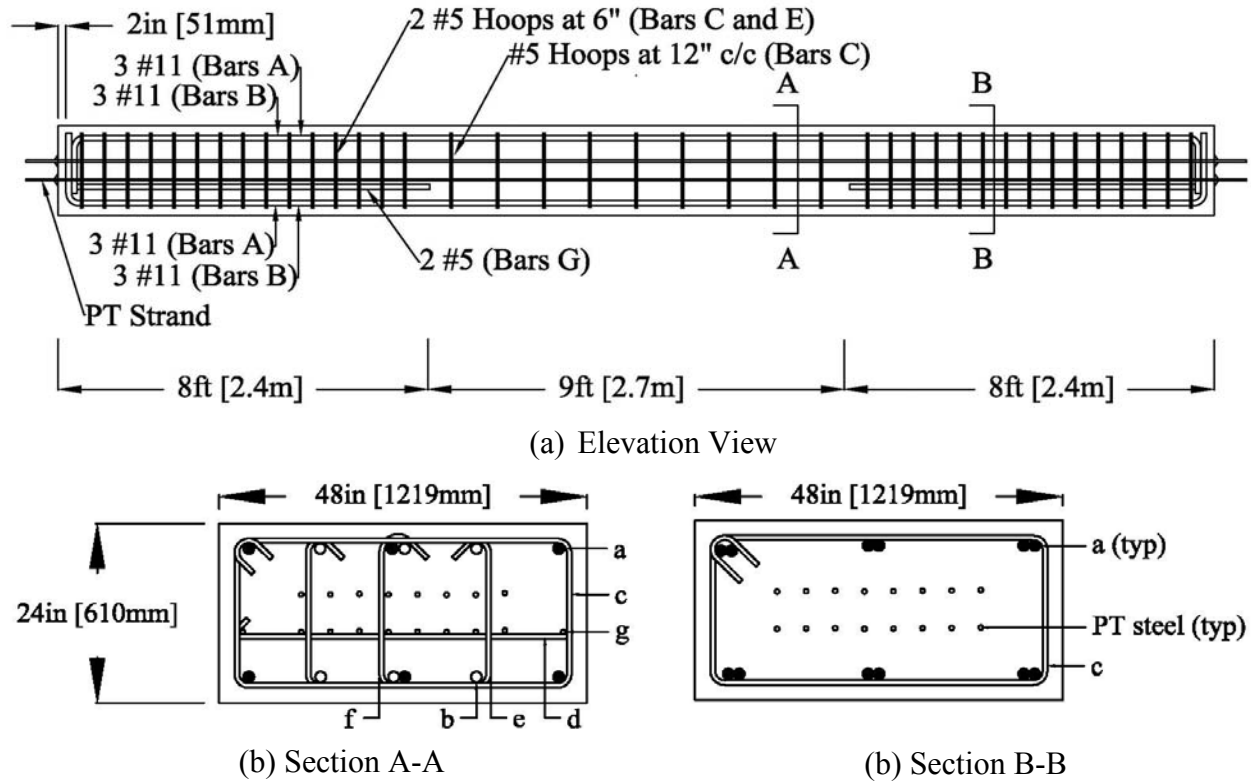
Large-Scale Geometry and Reinforcement Layout.
